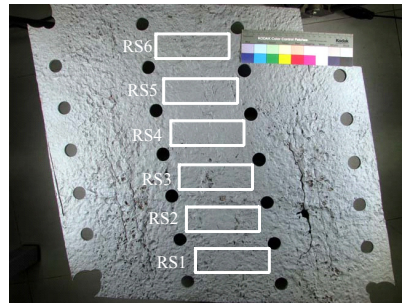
Fatigue crack on the corroded deck surface of the orthotropic steel bridge deck (Sakiya *et al.* 2007)
